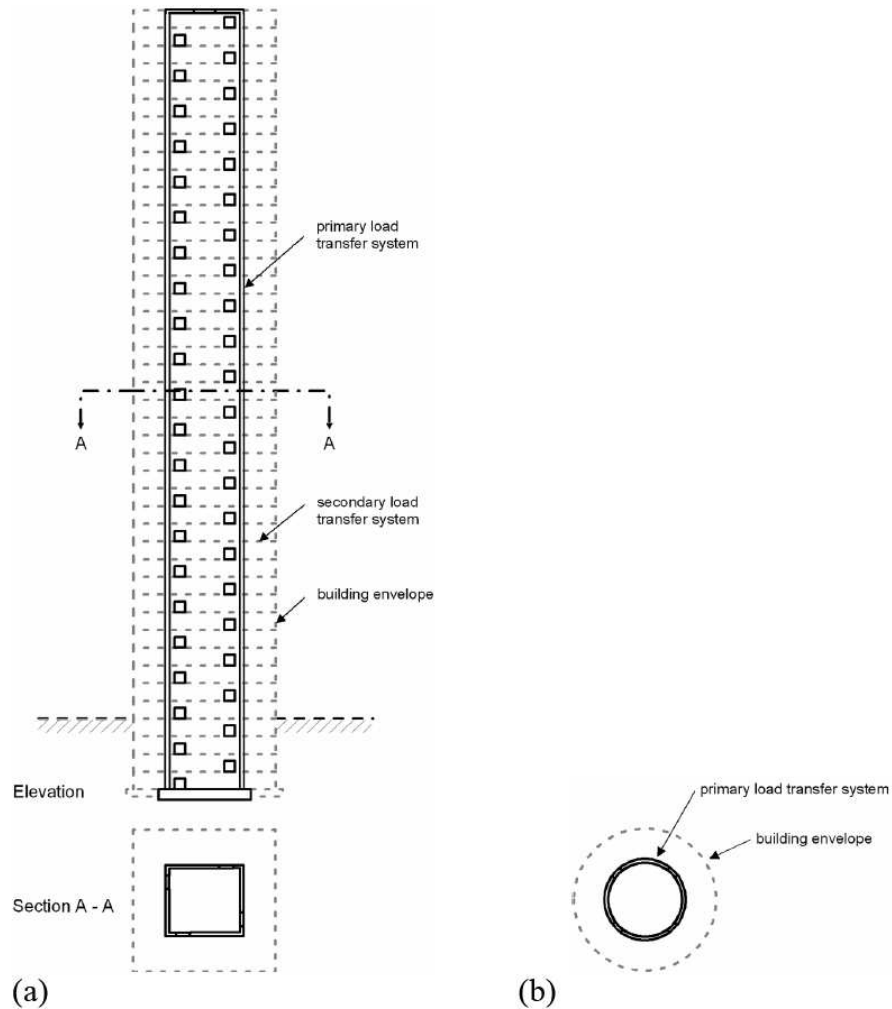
Primary load transfer system: a) Elevation and rectangular cross-section, b) Circular cross section. From Starossek [18].
